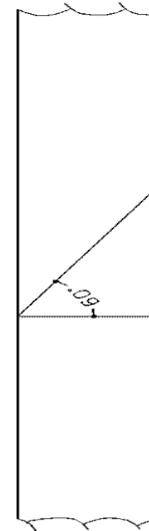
B. Scarf of 60° as an example of jointed beams at different scarf degrees (scarf joint connections are located exactly in the middle of the beams on the tangential face)
